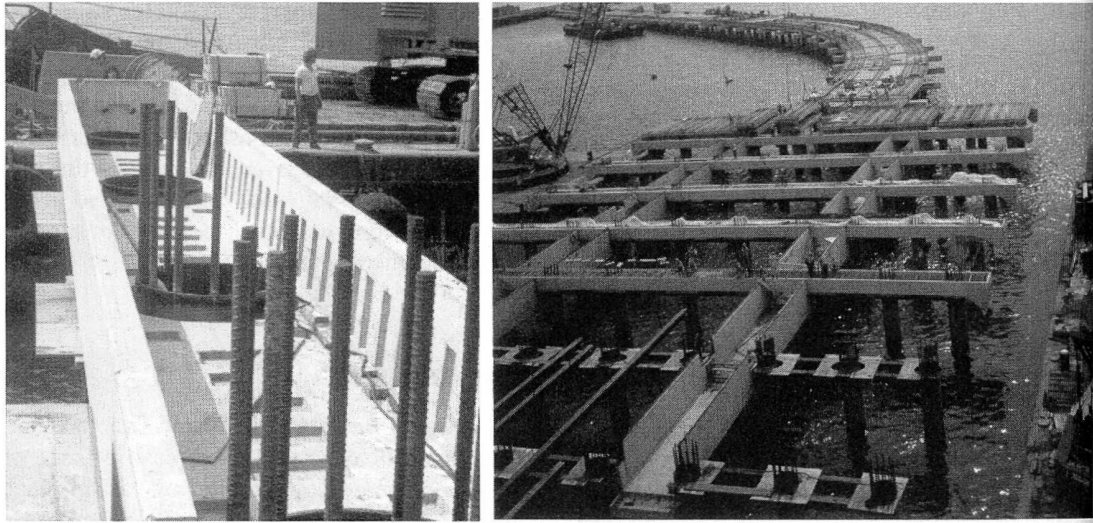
Precast /Cast in place concrete pile-cap (Port Engineering, 2004)
